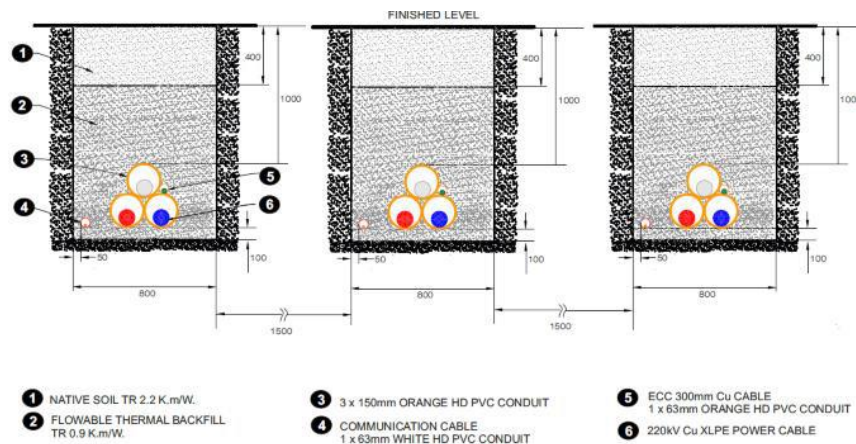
Dedicated Connection preliminary cross section of the 220kV underground trench
